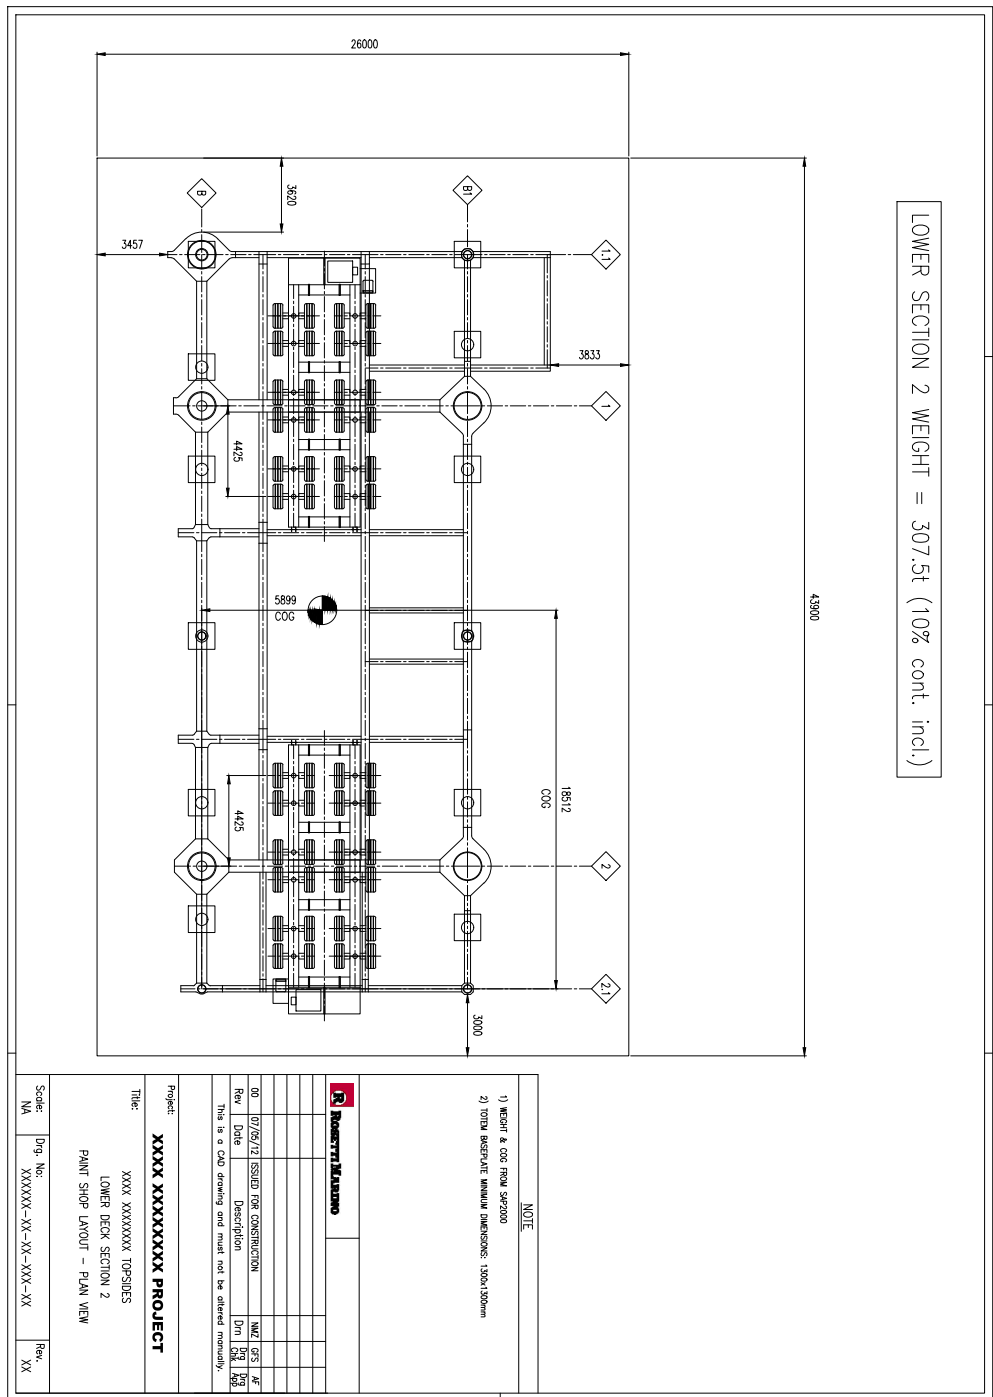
Lower level deck section 2 - Paint shop layout - plan view
